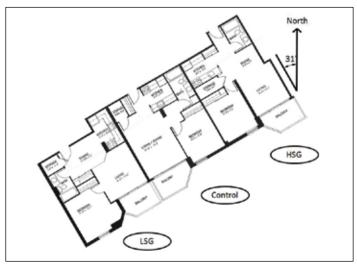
Test apartments oriented as in the building, facing east of south by 31°.
